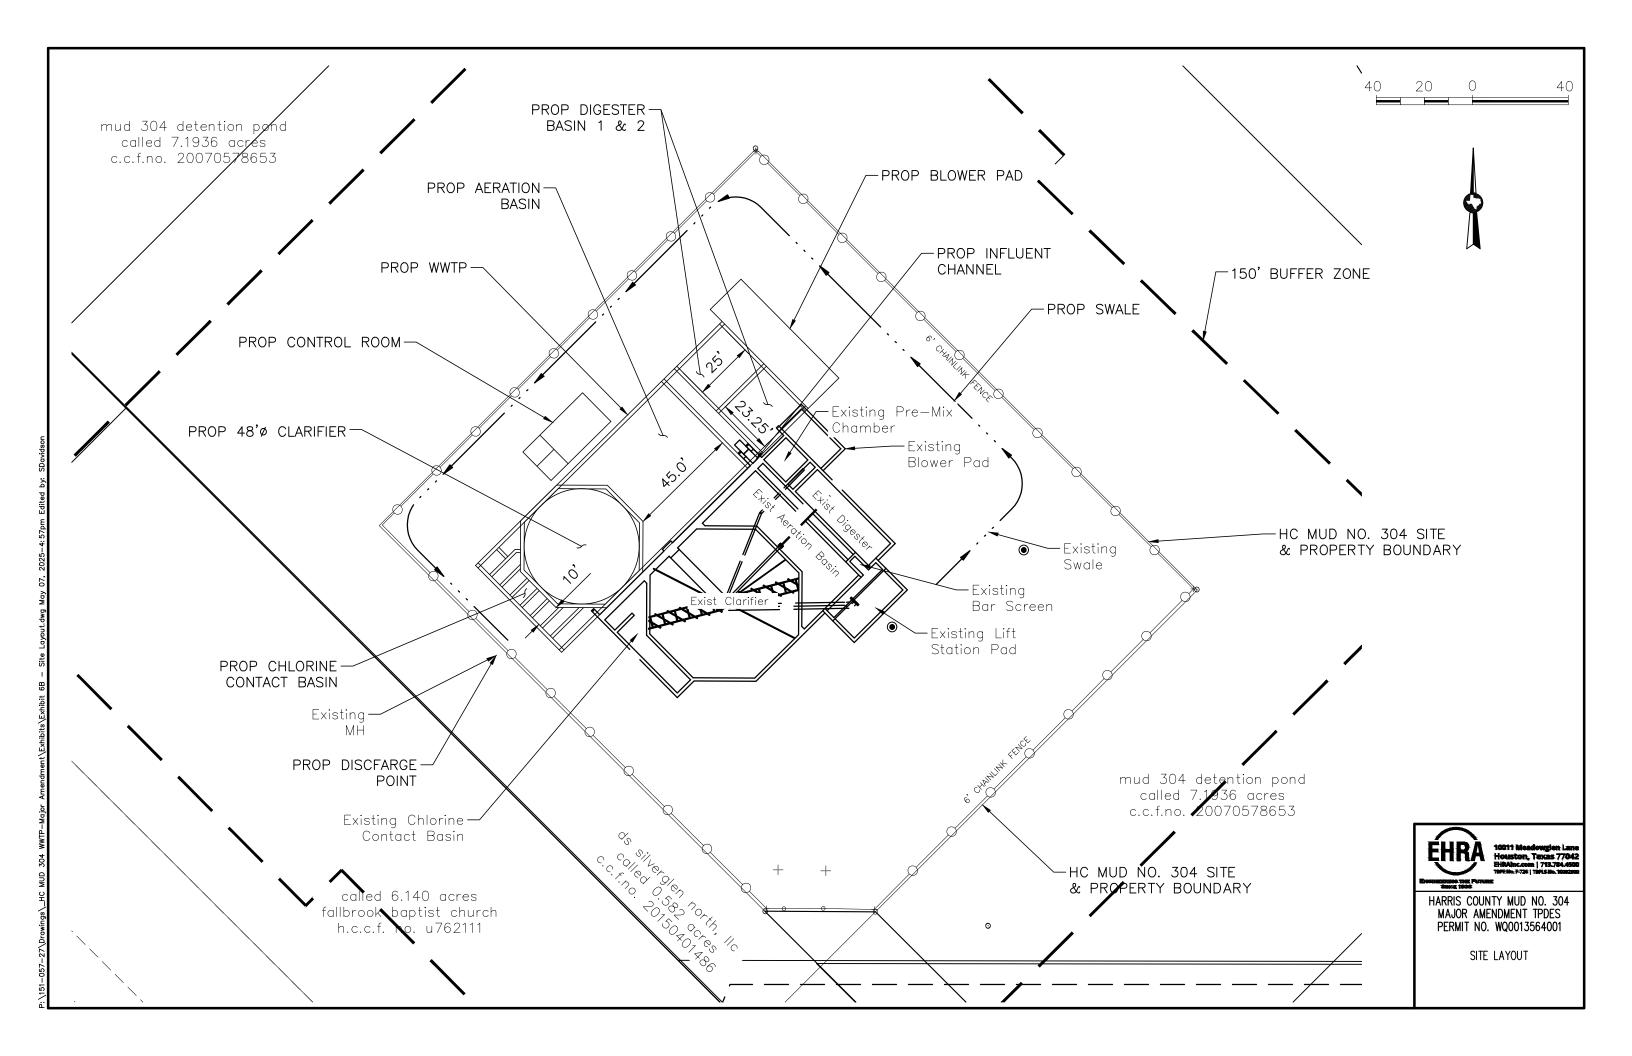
B – Site Layout (Corresponds to Technical Report 1.0, Section 3, Page 3 of 66)
